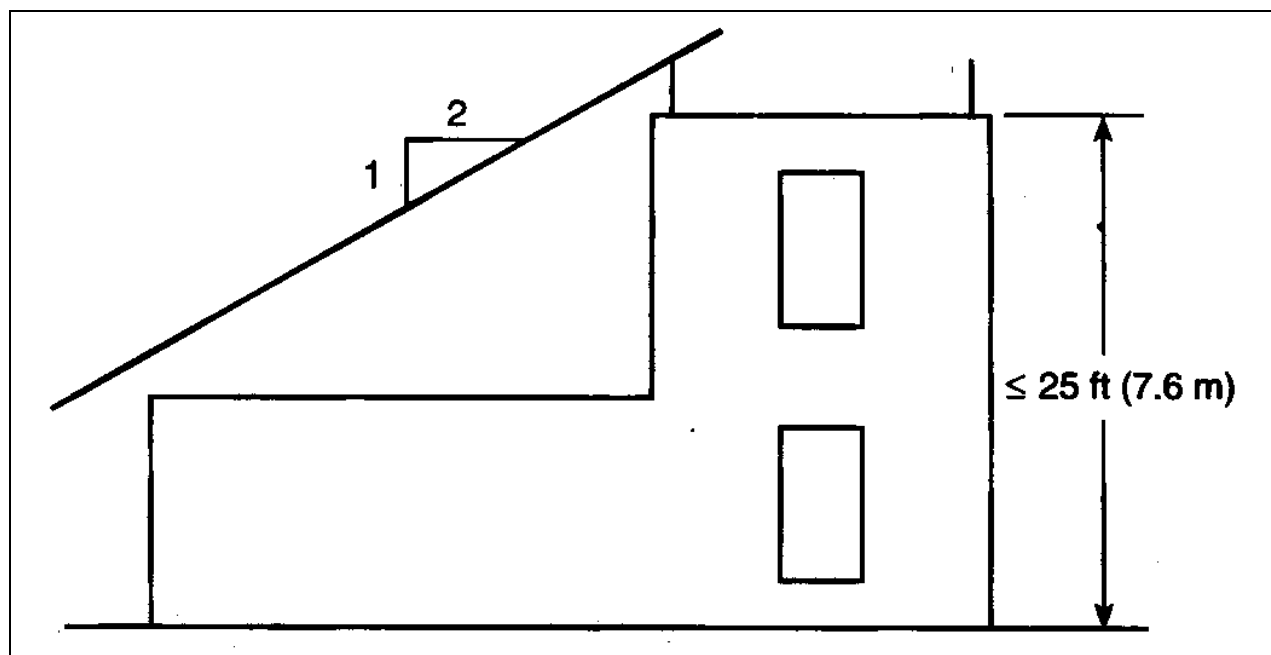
Lower roof protection for flat roof 25-feet or less high
